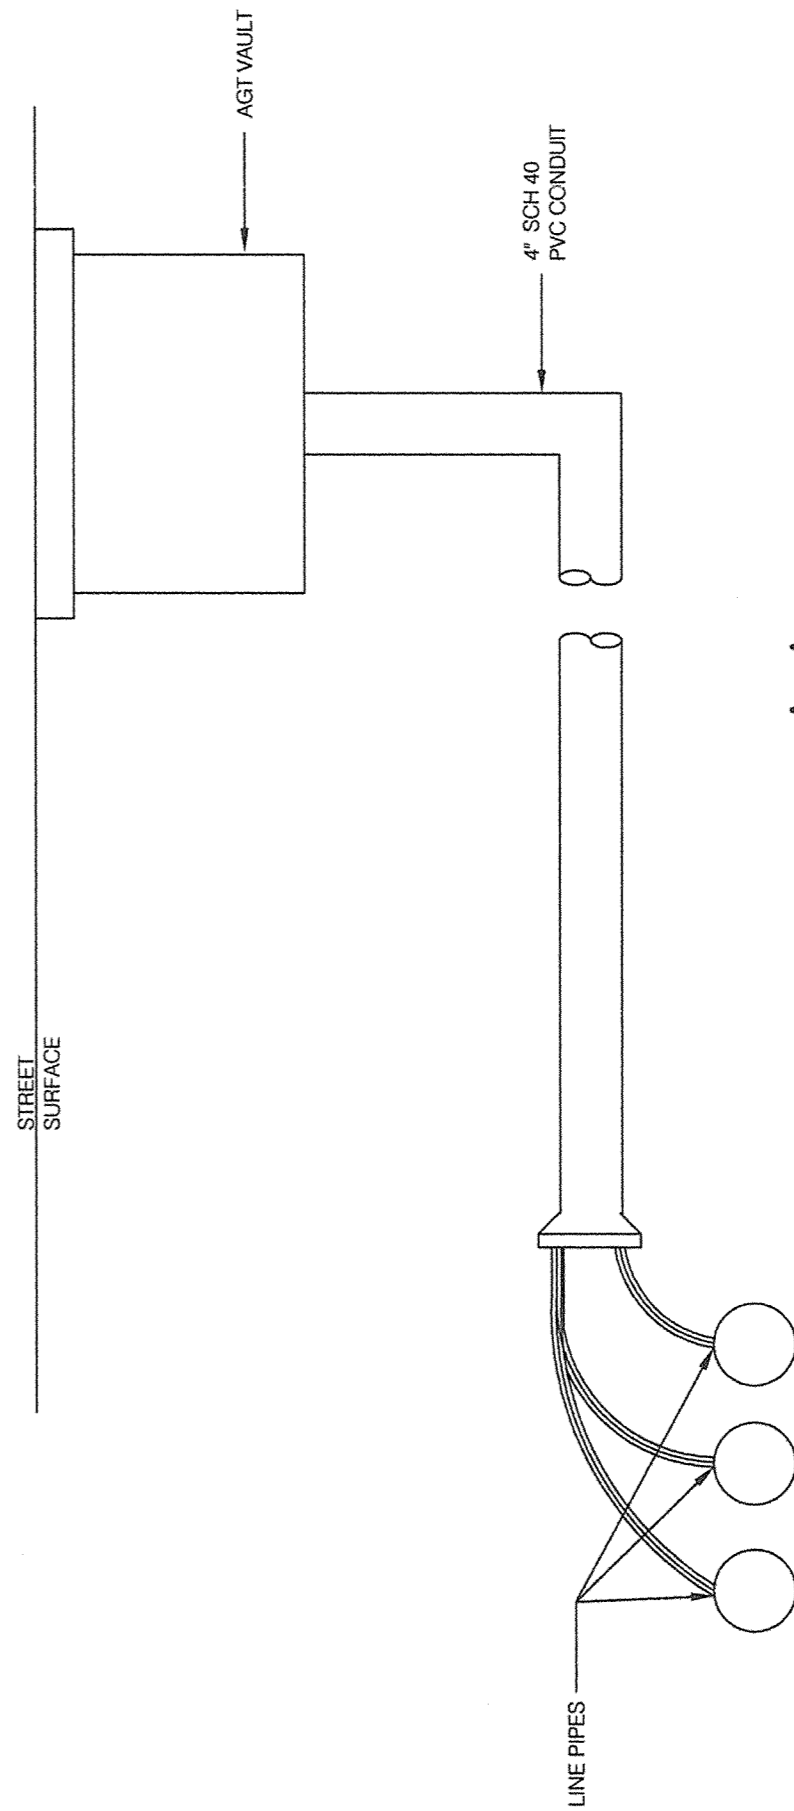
DETAIL OF CATHODIC PROTECTION LEAD ATTACHMENT
